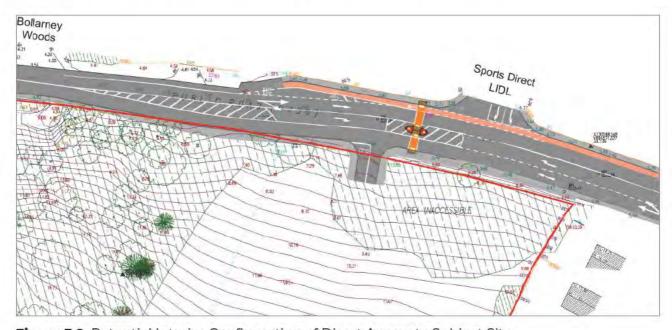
Potential Interim Configuration of Direct Access to Subject Site
